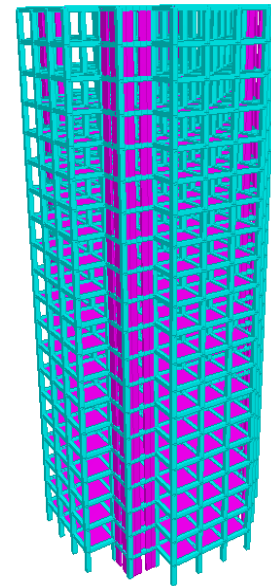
Case WO4: - (Bay size = 5 m x 4 m & shear wall opening area = 1 m x 4 m (20%))
